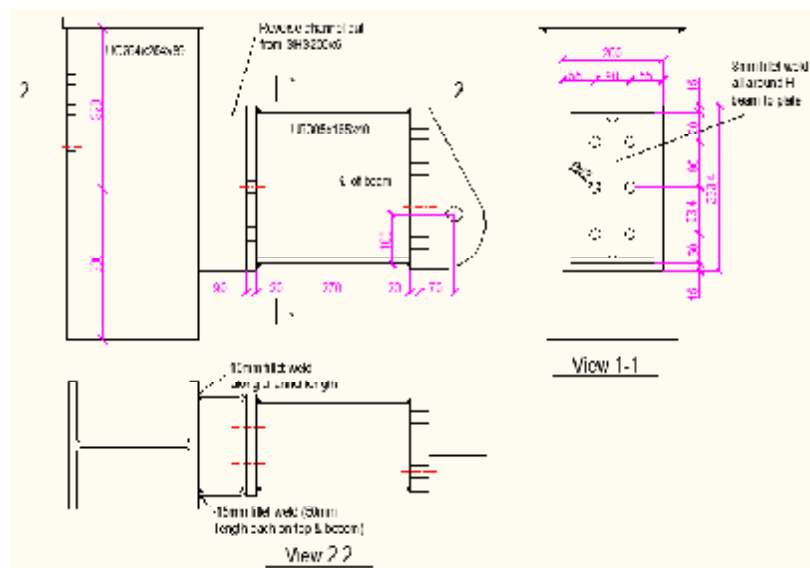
Geometry of the reverse-channel connection to steel column tested in Test 6.
